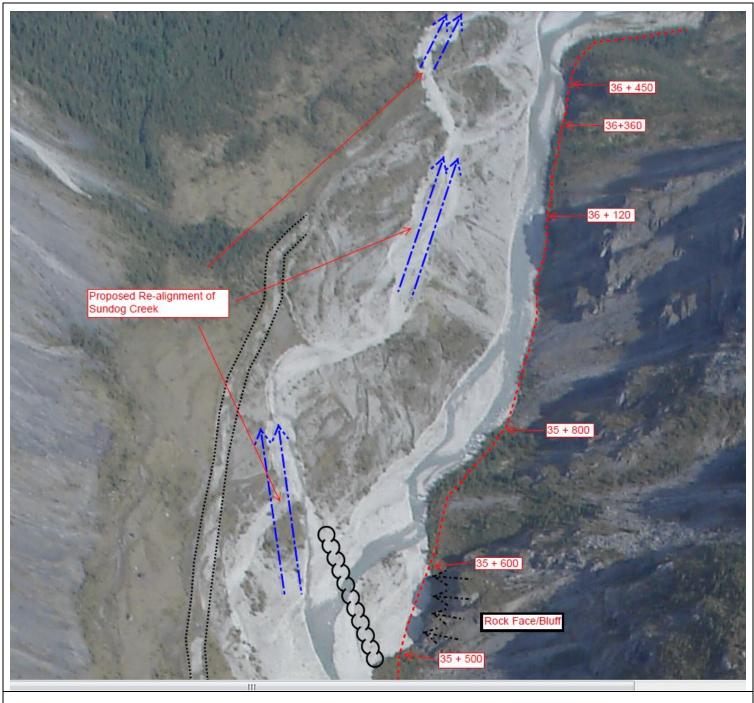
Aerial view looking north from KP 35+500 to 36+450.
